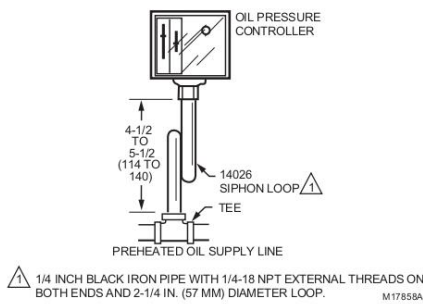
Mounting of a siphon loop, with approximate dimensions in in. (mm).
